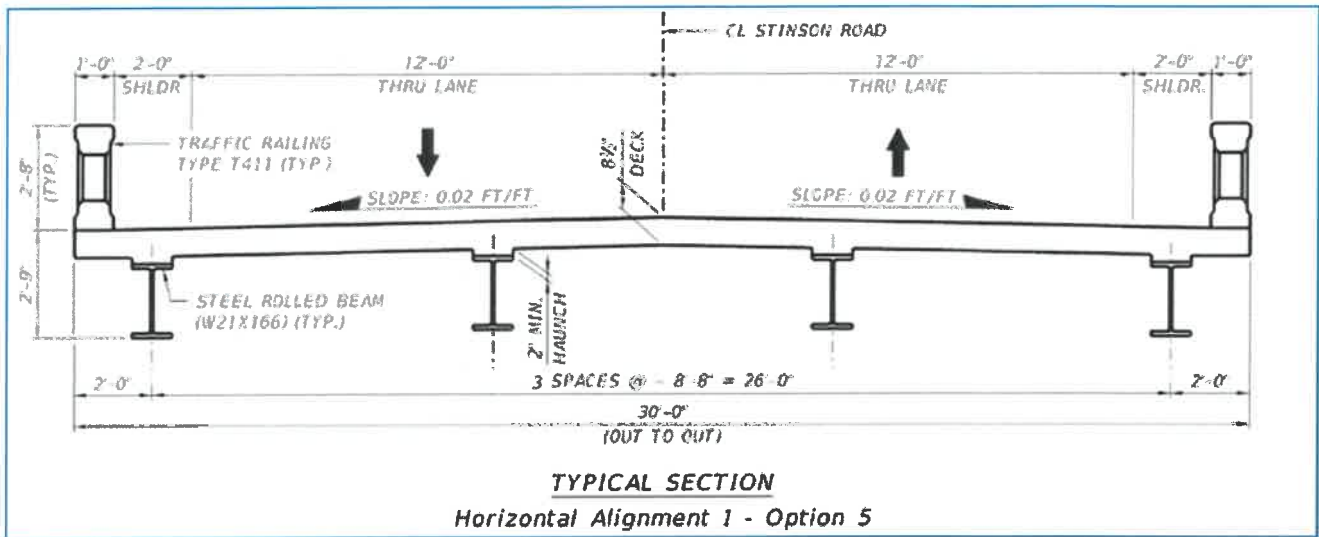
Steel Rolled Beams (W21X166) Typical Section
